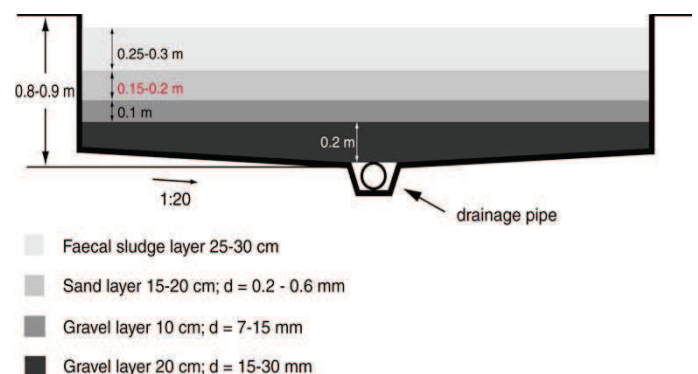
Structural principle for a drying bed profile (for faecal sludge dewatering).
